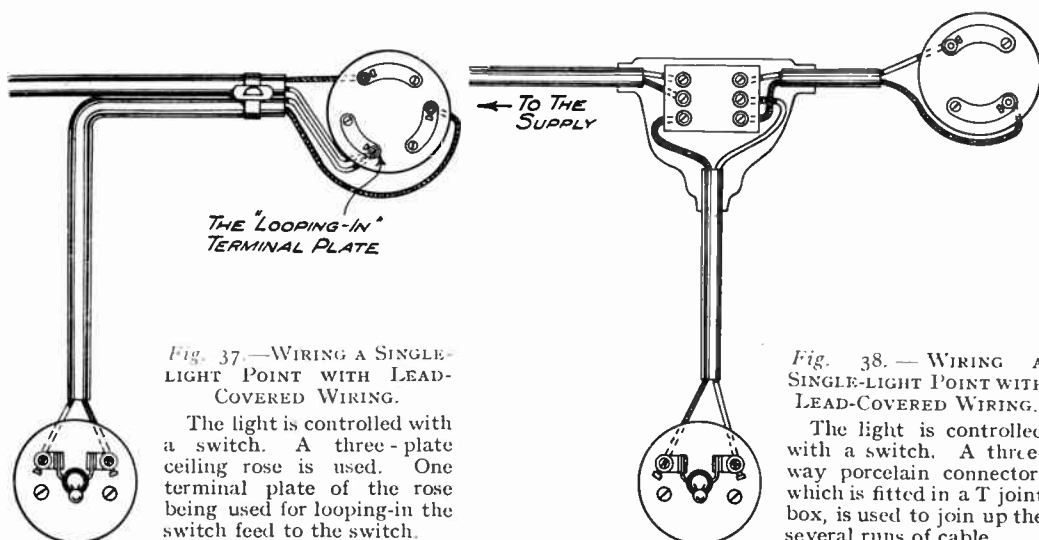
WIRING A SINGLE-LIGHT POINT WITH LEAD-COVERED WIRING.
